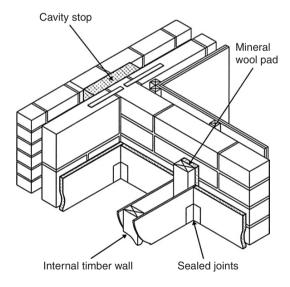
Wall type 3 - external cavity wall with internal timber wall
